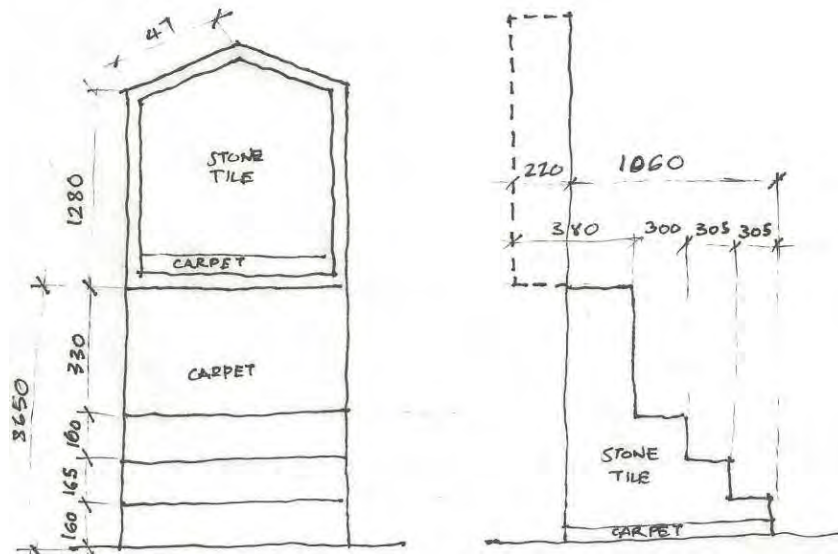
(b), Elevation and section of the Mimbar (Author, 2011)
